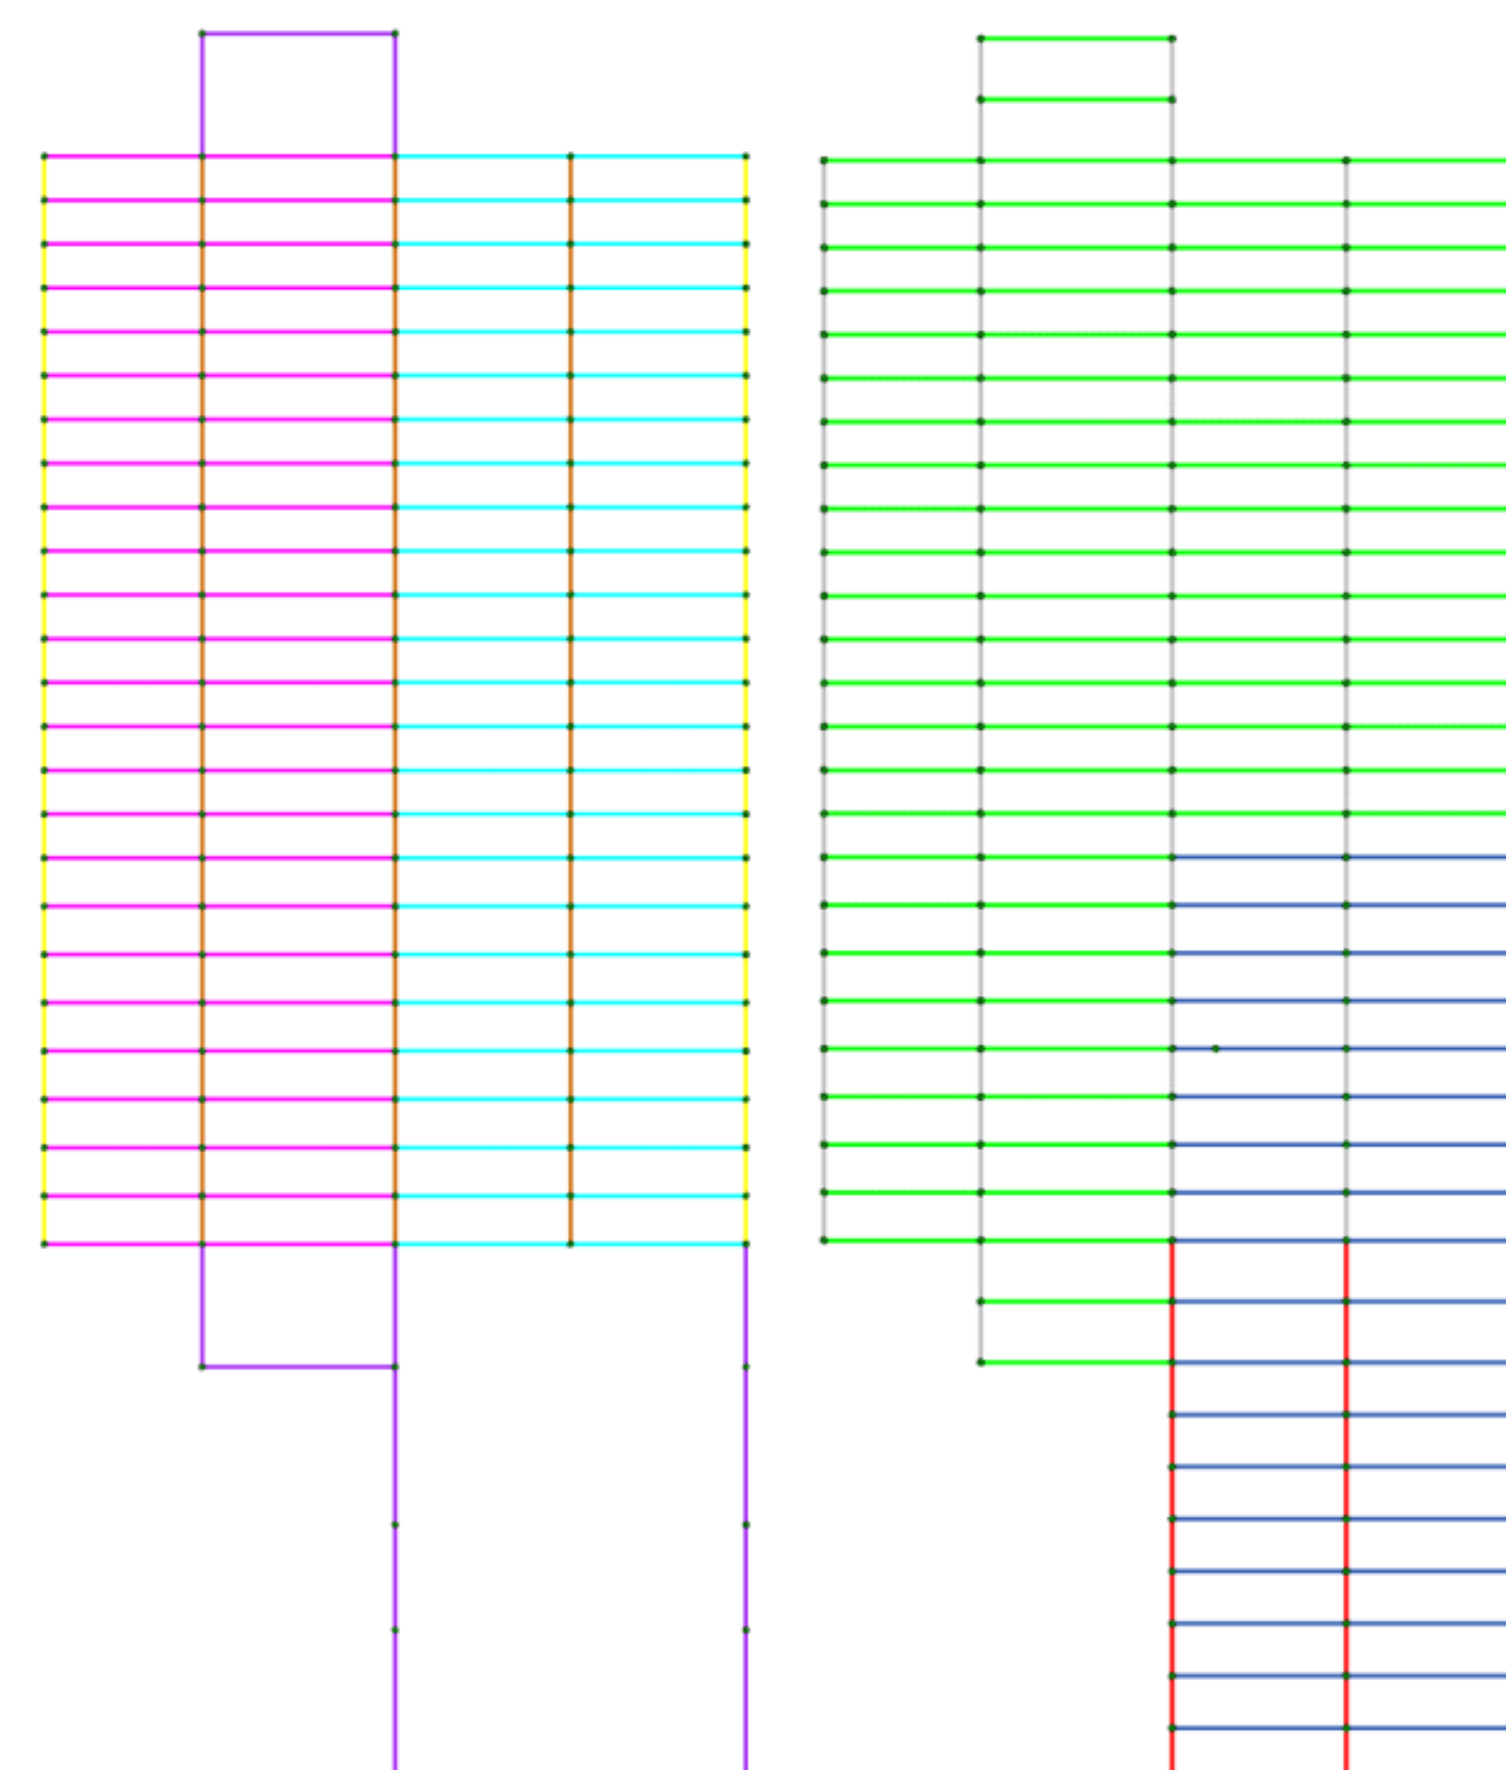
First Floor (Left) and Second Floor (Right) Section Sets
